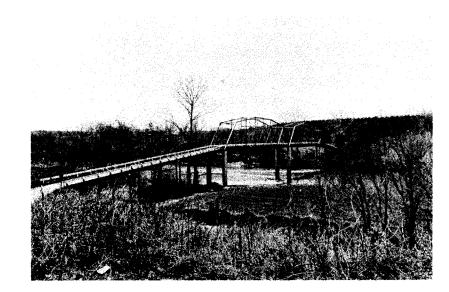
Two-span Camelback truss built in 1903 over the Staunton River in Campbell County. Note piers are lally columns, patented metal cylinders filled with concrete, with lateral bracing between them. (Campbell County, photo no. 12520-14-20A.)
